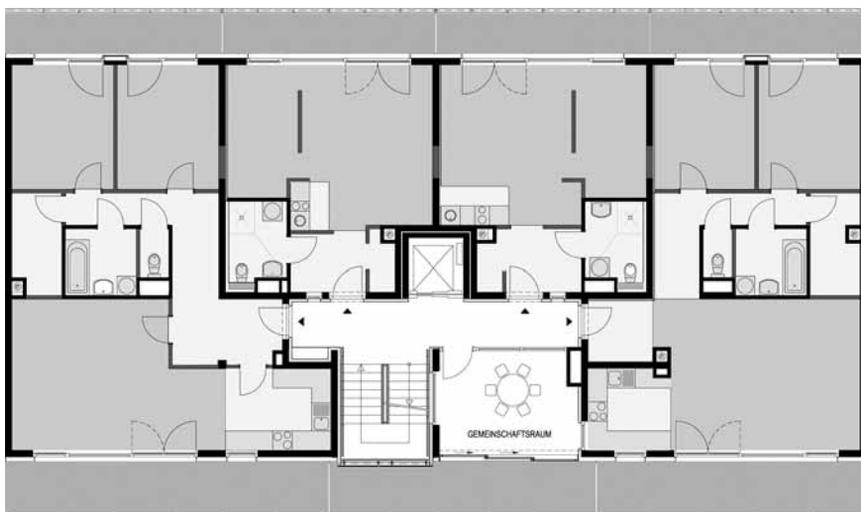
Floor layout with common room Christine Zwingl, FWS II
